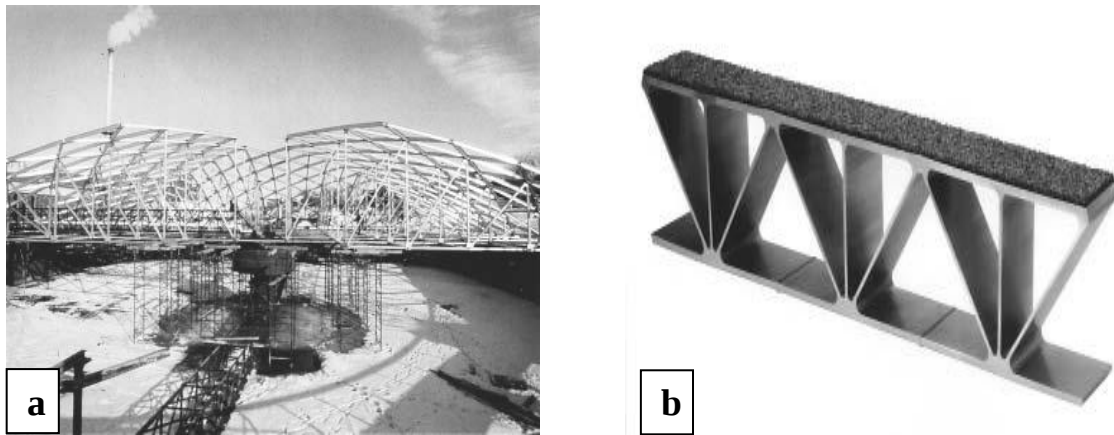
6063 alloy a)roof construction tubes and b)stiffened deck shape
